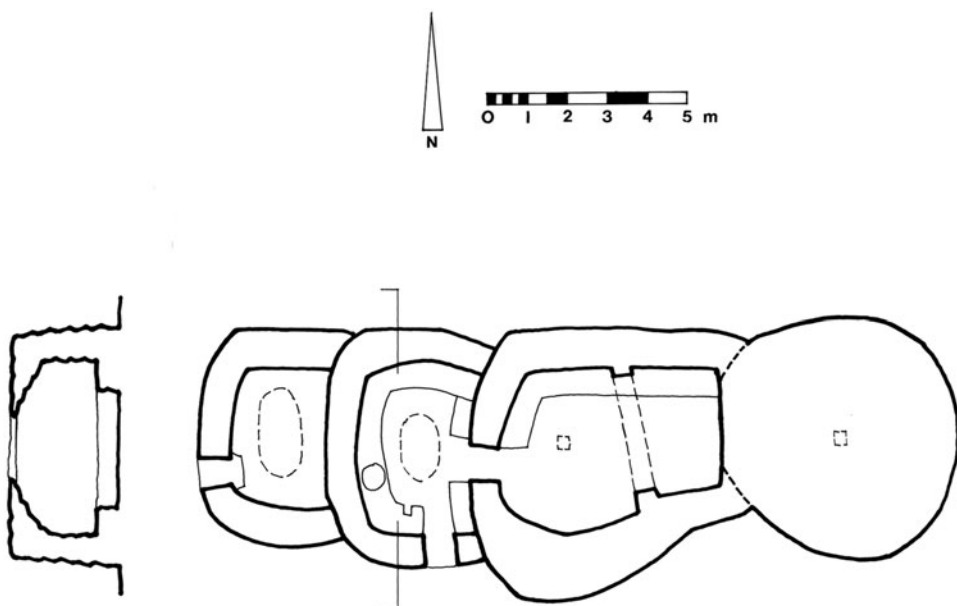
Katsiveli Mitato (2.19) plan and cross-section (O. Rackham, S. Donovan).
